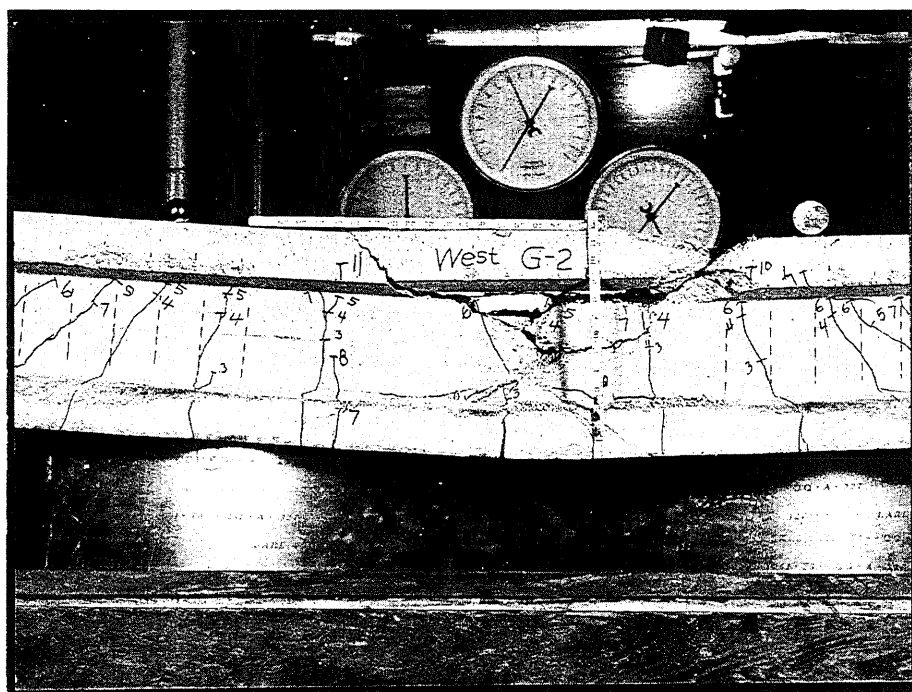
FLEXURAL FAILURE IN A BEAM WITH FOUR WIRES AND WITHOUT STIRRUPS BETWEEN THE LOADS
